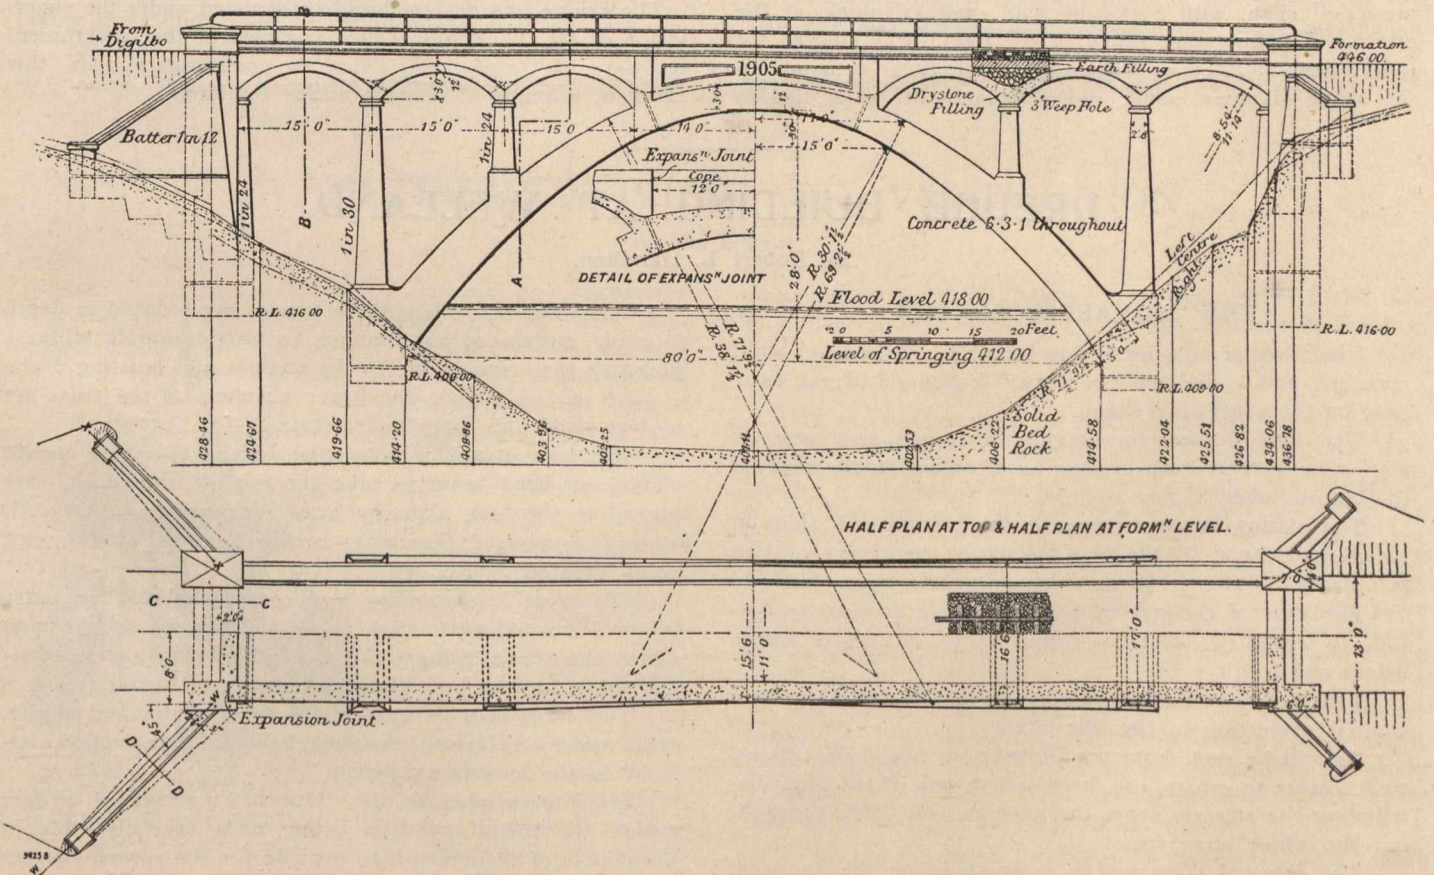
Elevation and Plan of Concrete Bridge, Queensland.
